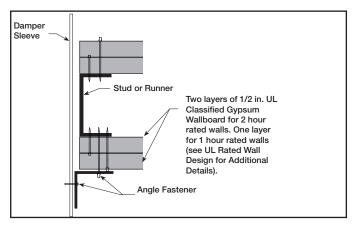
Single Side Angle With Steel Stud Wall - Angle Over Wallboard
